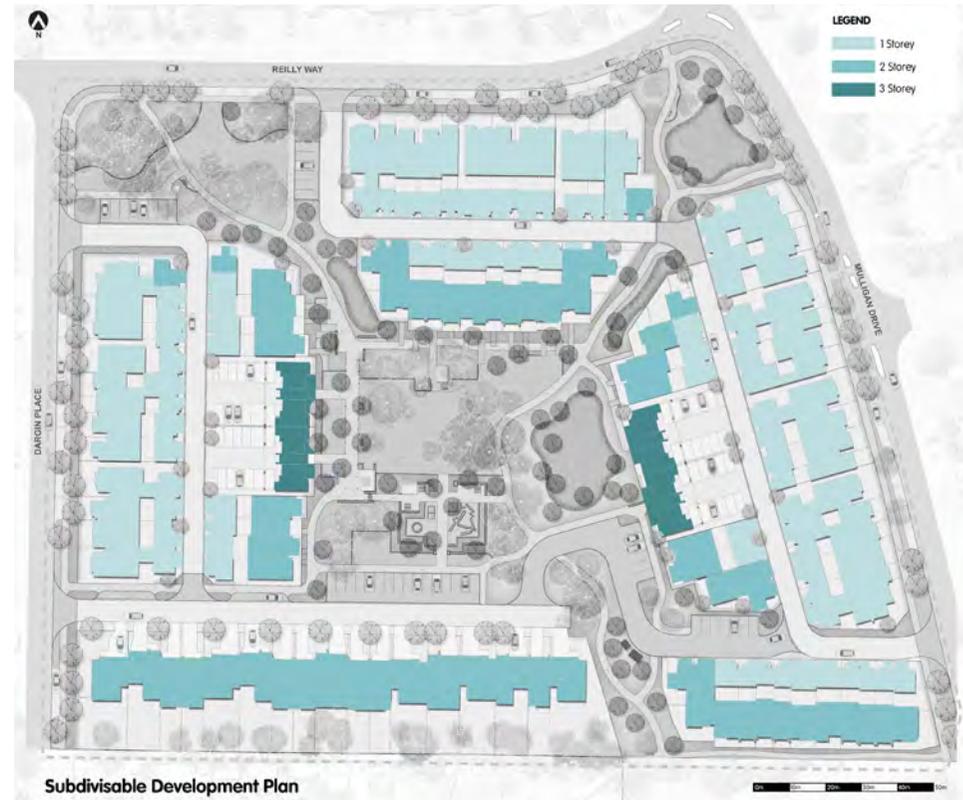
ILLUSTRATIVE BUILDING HEIGHTS PLAN
